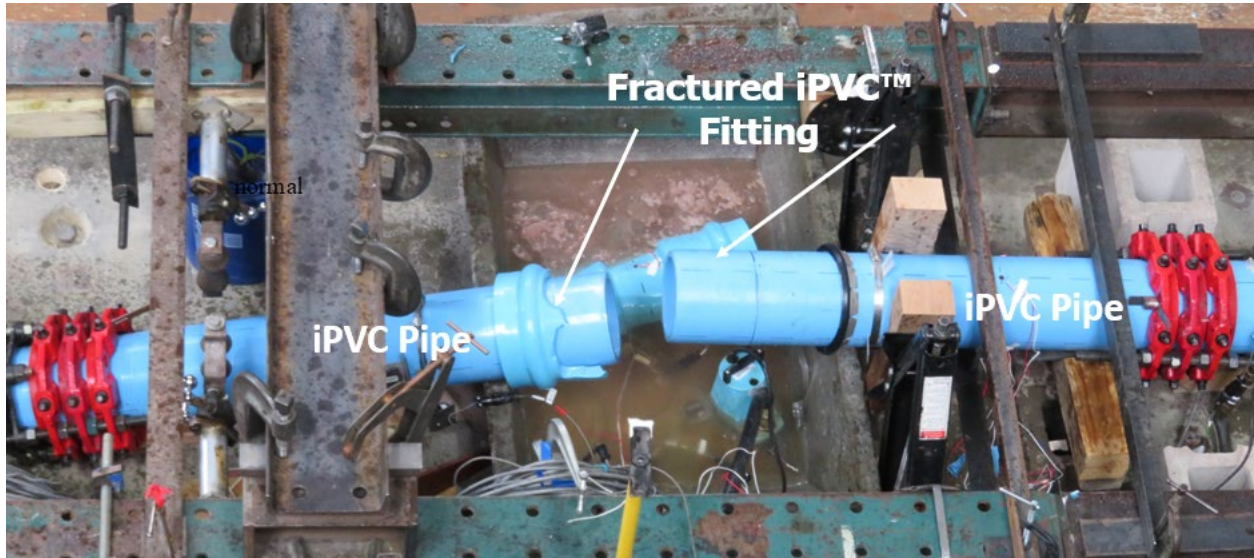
Photo of Failed iPVC™ Fitting for Compression Test
